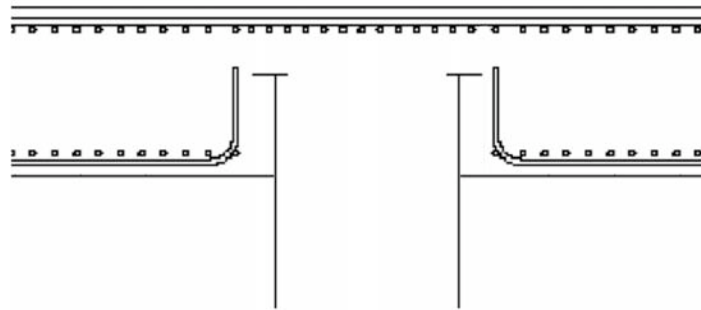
Detailing of longitudinal reinforcement adjacent to the tube
